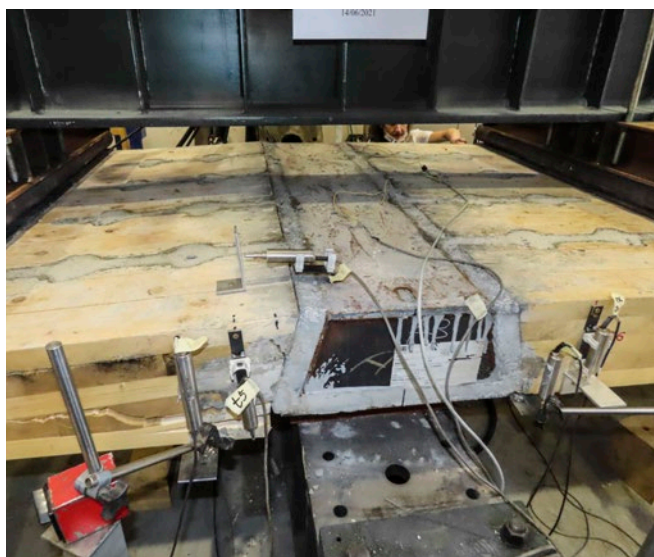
TIMBER PANEL FAILURE IN SPECIMEN A3 (WITHOUT DELTABEAM® LEDGE)
